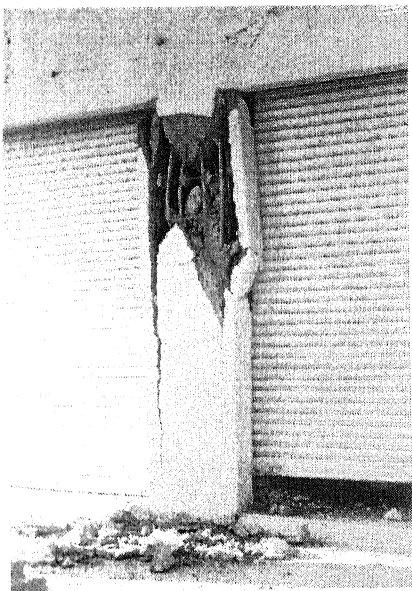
Severe damage to the ground story columns in the open ground story building (Murty et al., 2002)
